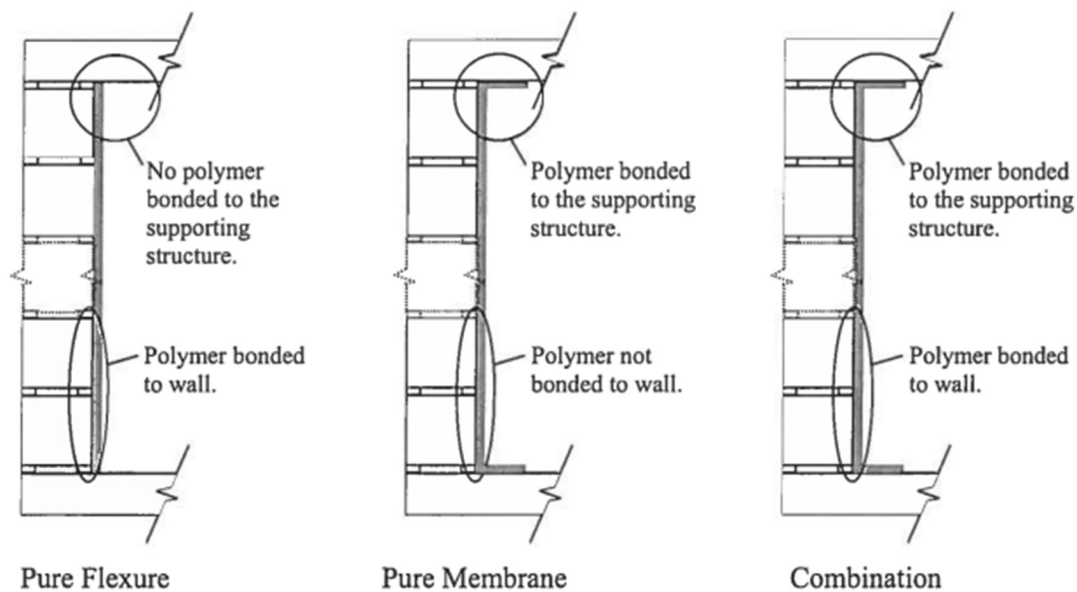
Spray-on polyurea application approaches on masonry walls (Dinan et al. 2003)
